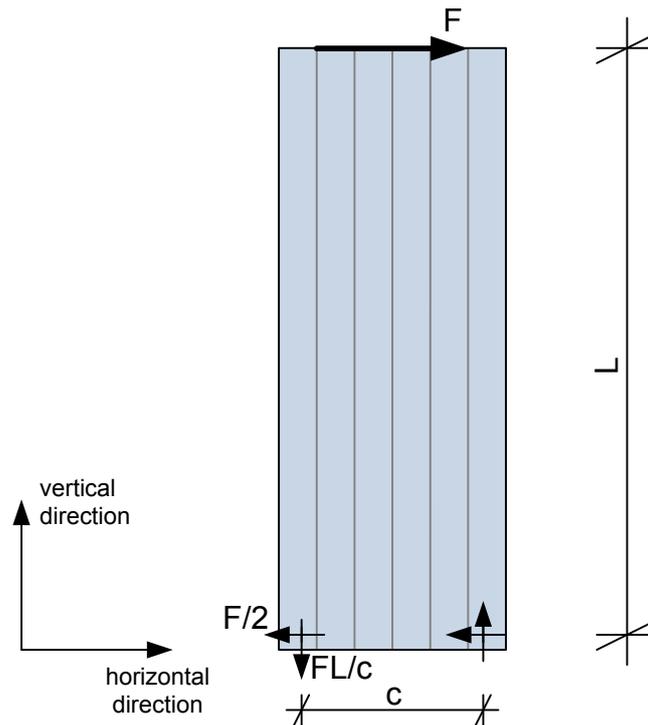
Forces at an in-plane shear loaded wall panel
